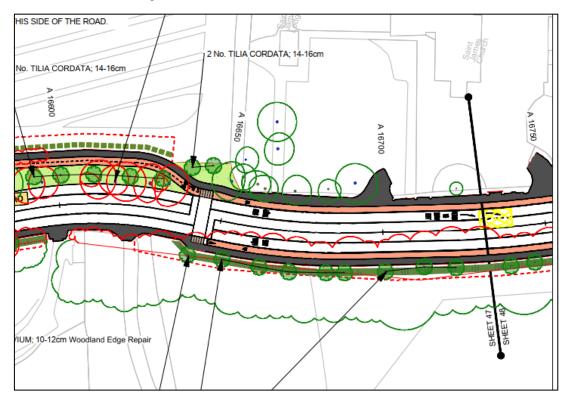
Extract from Landscape Drawings at Beachamp House (Sheet 47)
